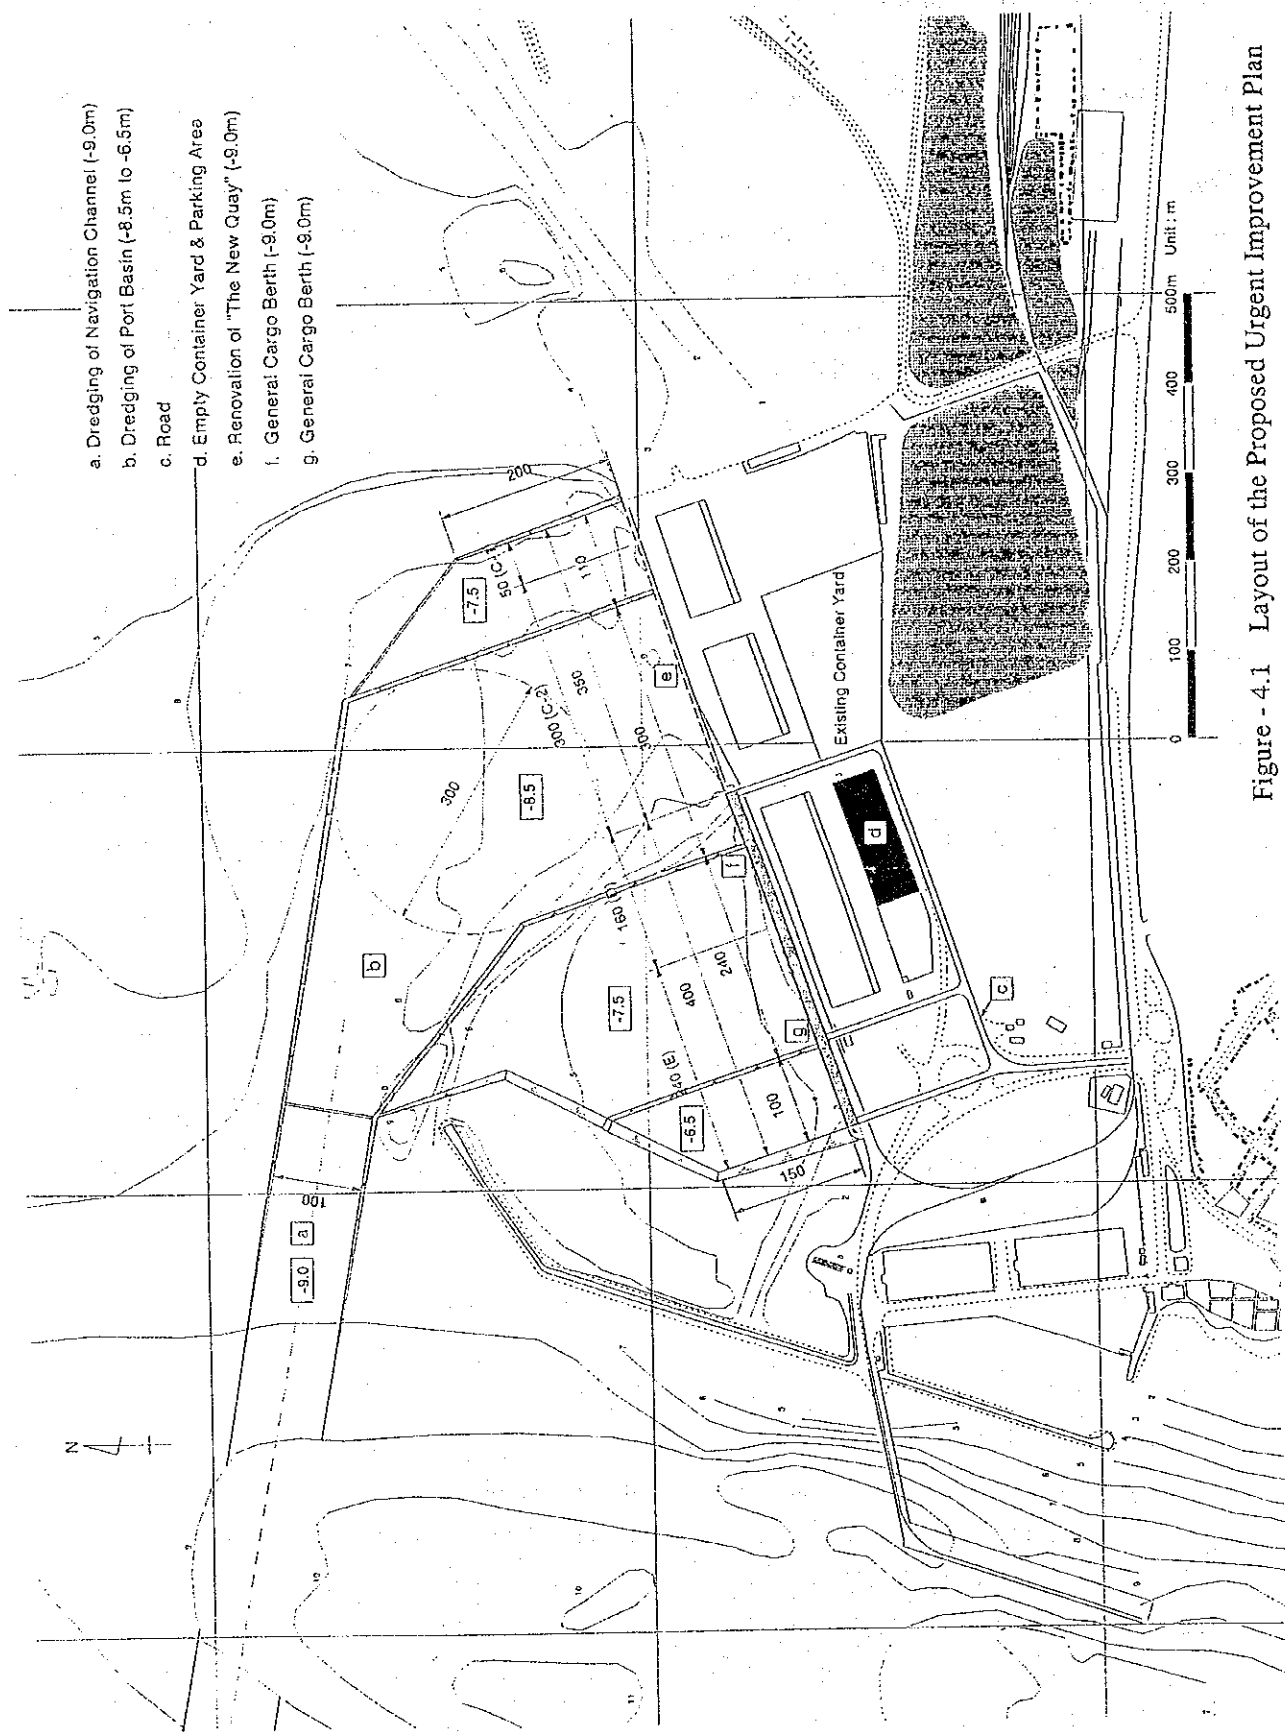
Layout of the Proposed Urgent Improvement Plan
